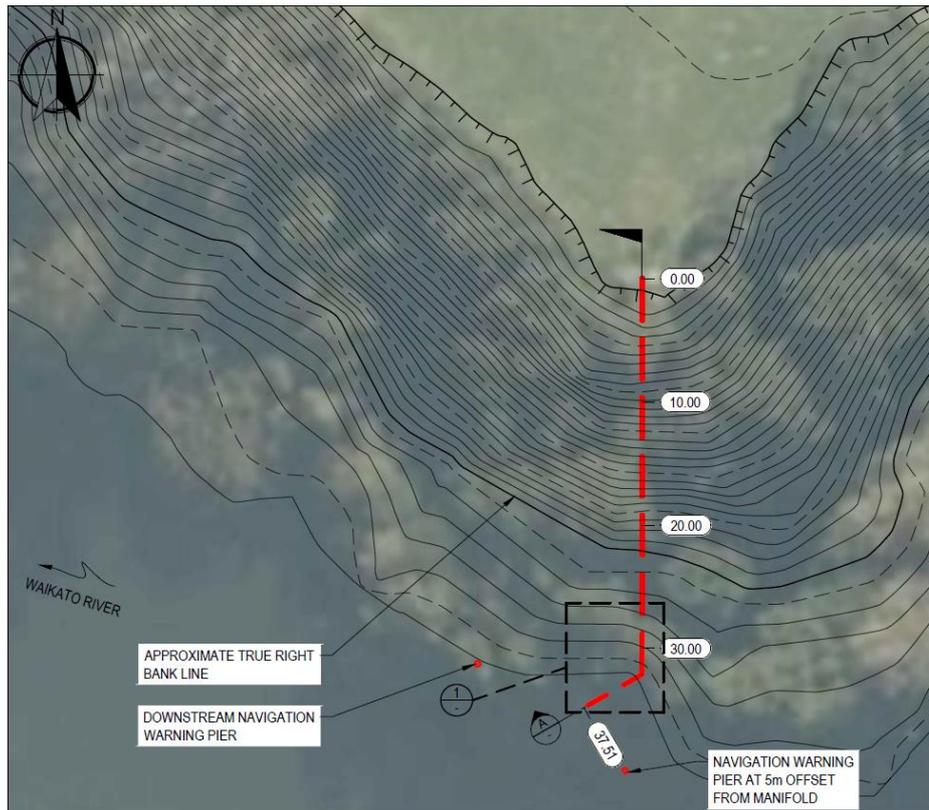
Aerial plan showing the location of the outfall pipe into the Waikato River (source: PDP)
